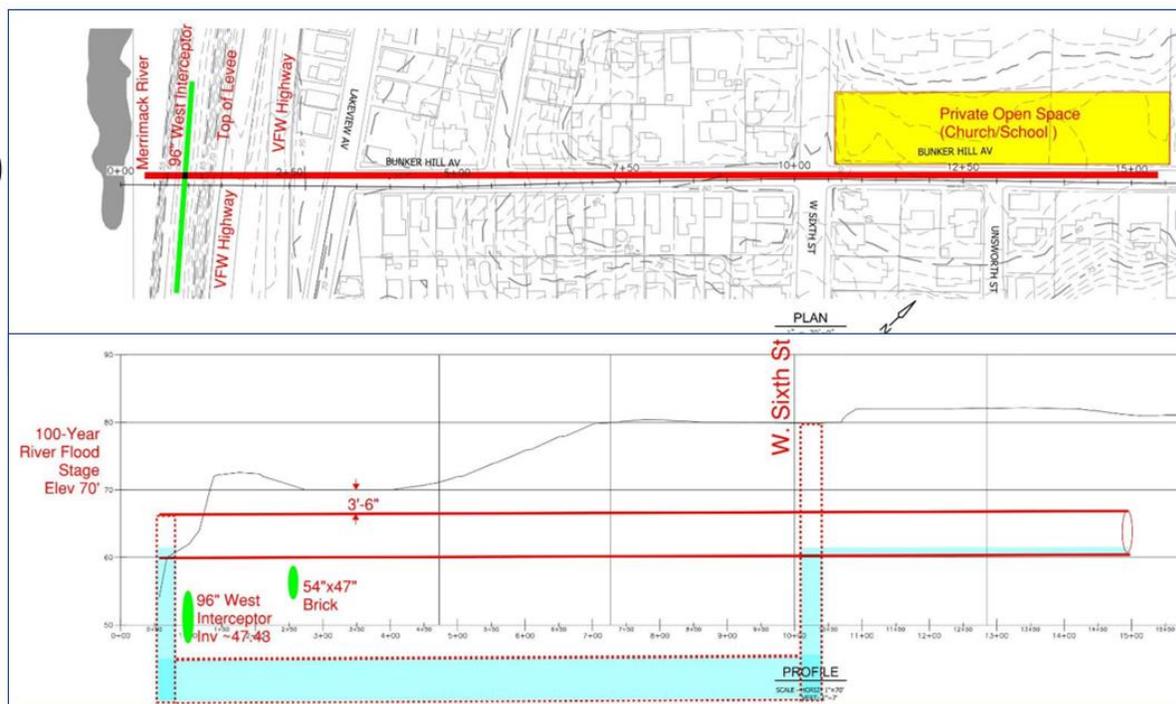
Bunker Hill Trenchless Crossing of VFW Highway
